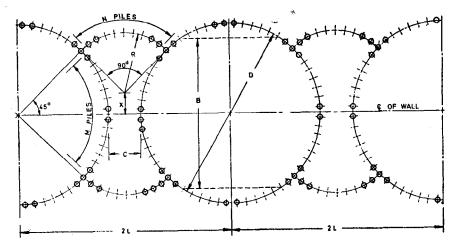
DETAILS FOR LAYOUT OF CIRCULAR SHEET PILE CELL
